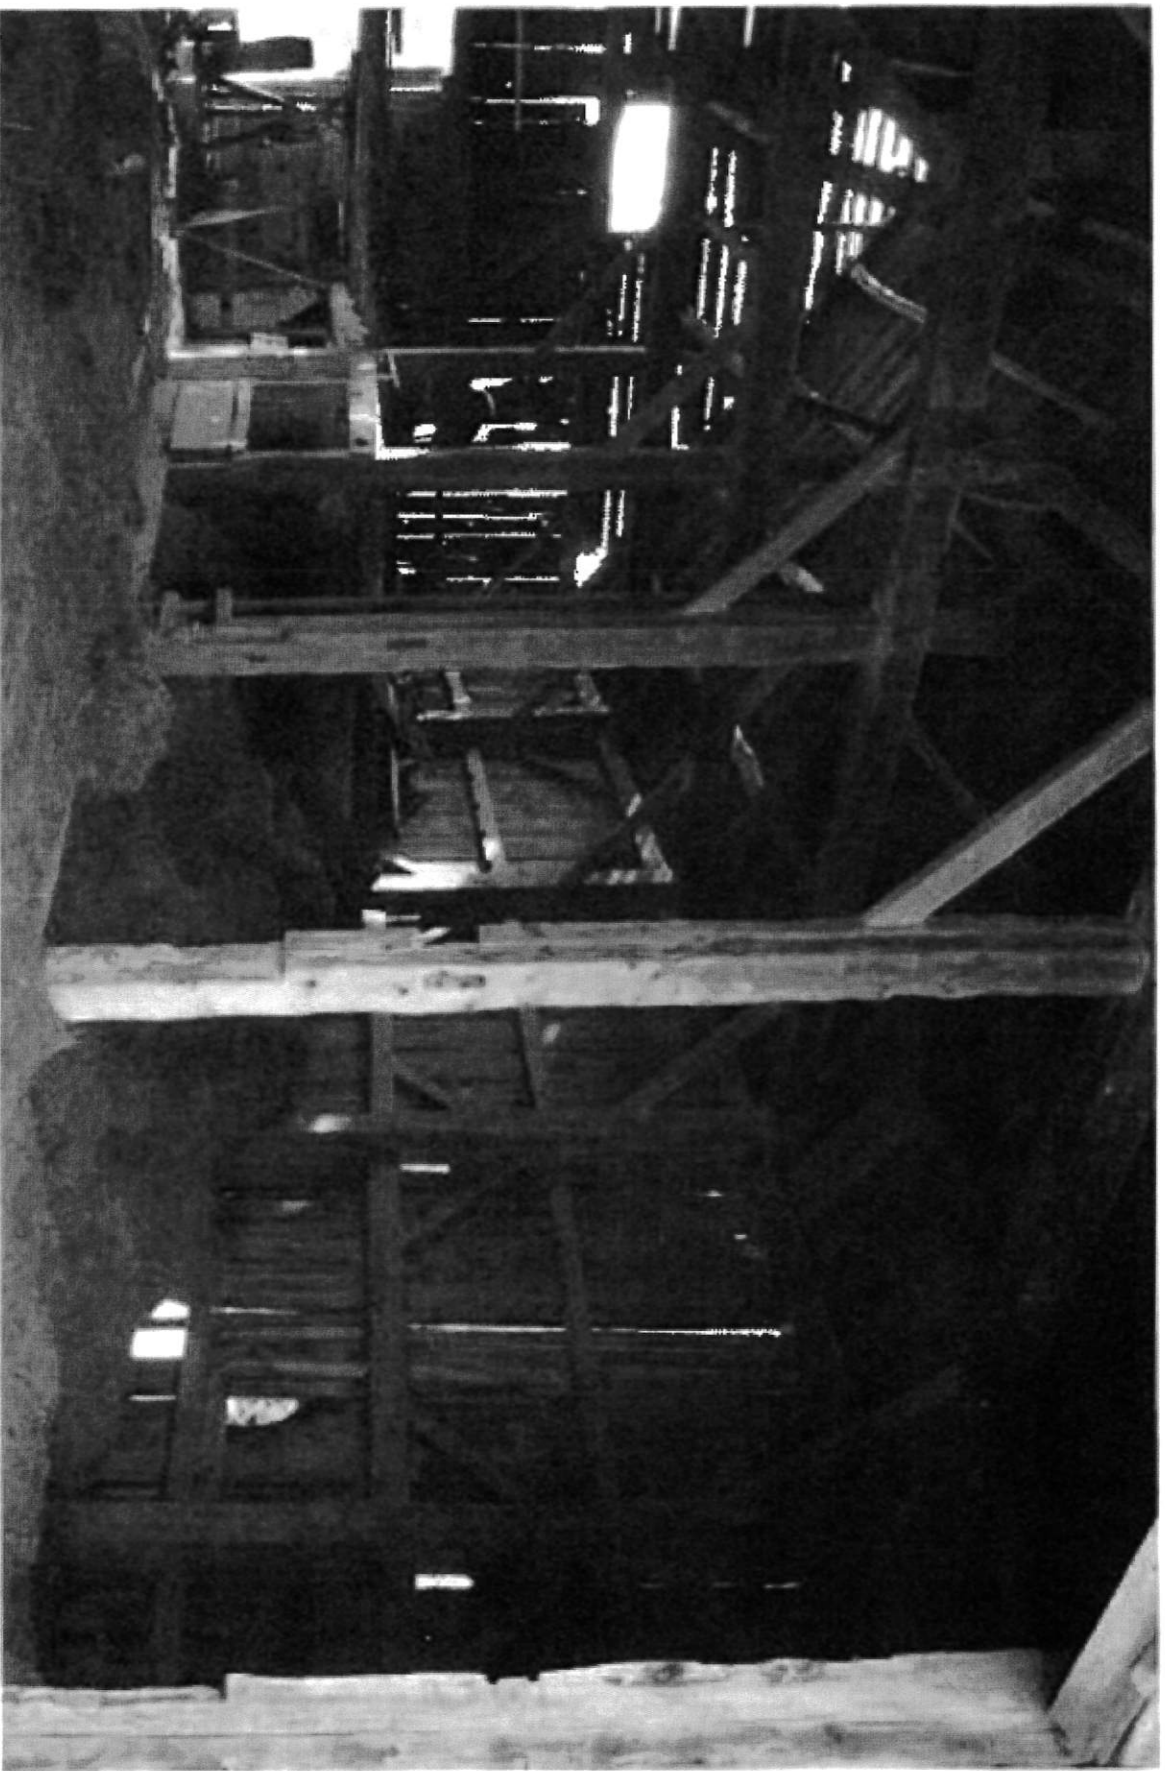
The west side (*right*) of this circa 1840 gable-front bank barn would be filled to the rafters with hay. Note the purlin frame roof of this New Hampshire barn.
